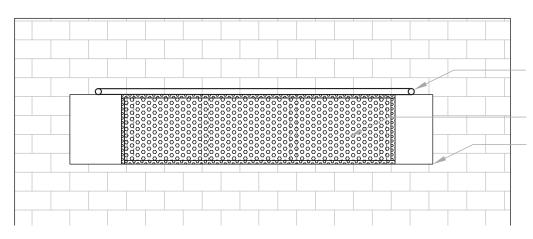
Bench without backrest. Plan. Scale:1:25 (Author, 2008)
